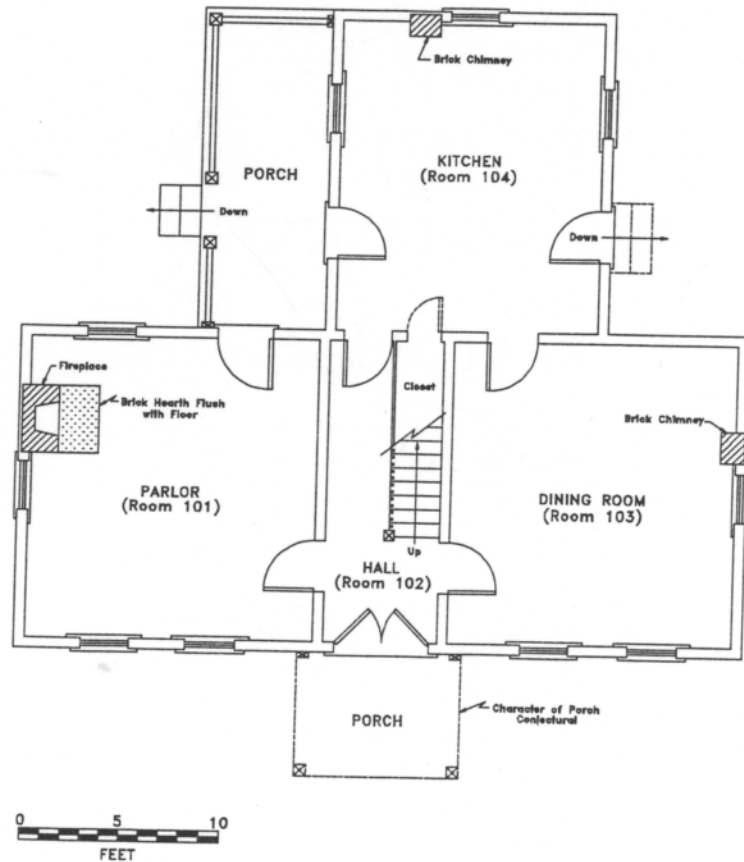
Ground floor plan of the Williamson House, as originally constructed, ca. 1879-80.
